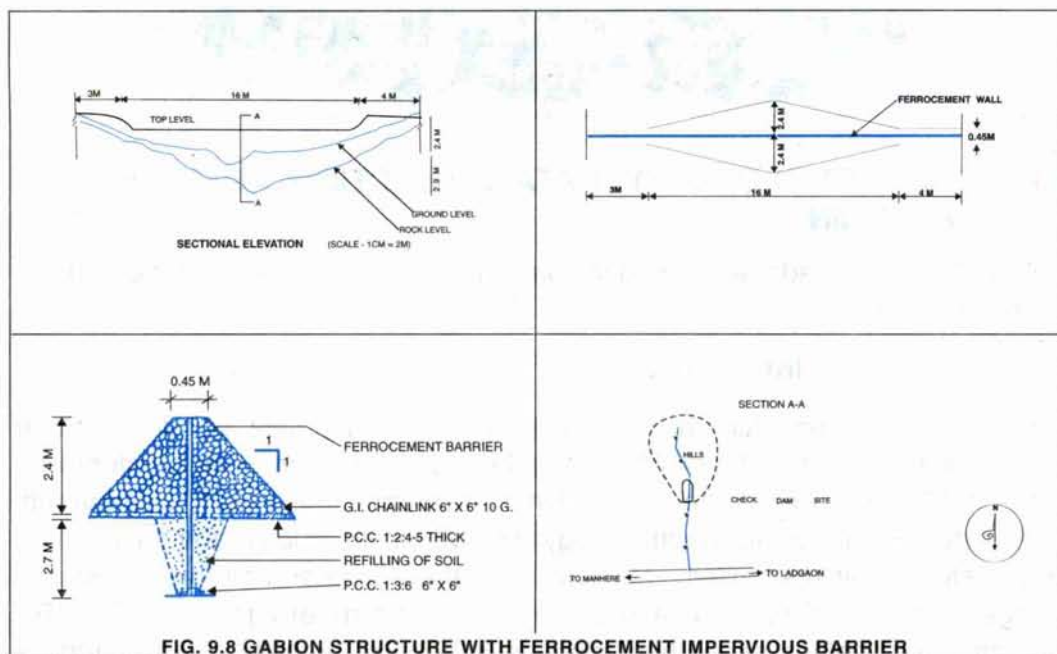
GABION STRUCTURE WITH FERROCEMENT IMPERVIOUS BARRIER
